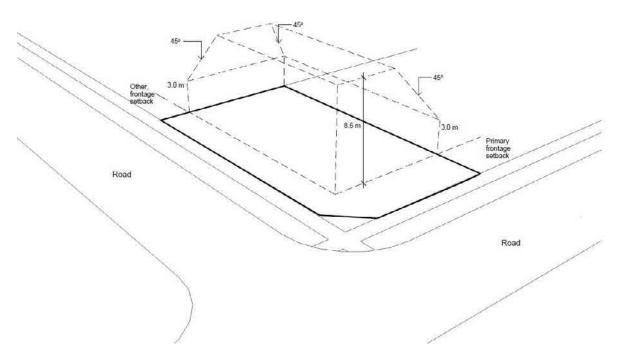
Building envelope for corner lots as required by clause 8.4.2 A3(a) and clause 8.5.1 A2(a)
